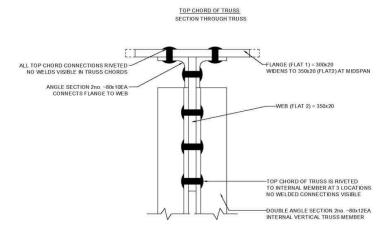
Observed truss connection (applicable to Figure 8 and 9)
